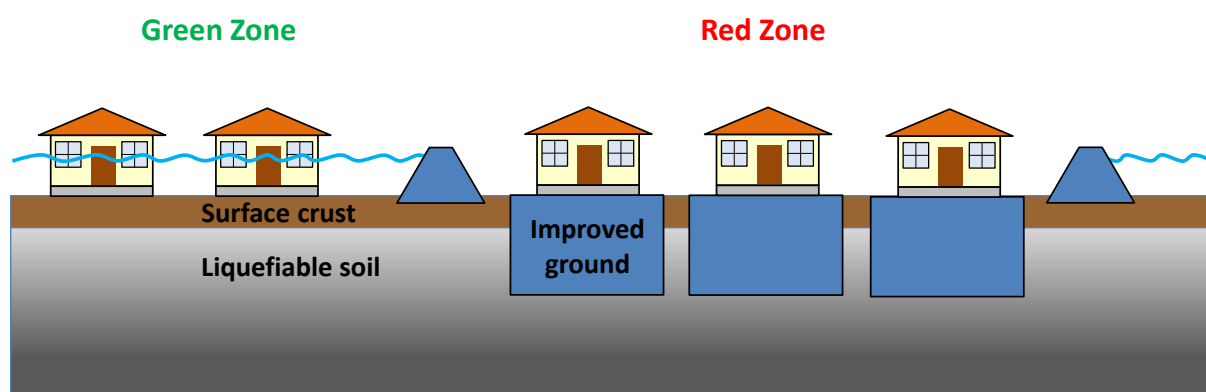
Concept 4 - Flood mitigation with ground improvement & dwellings at ground level. New dwellings have standard TC2-type foundations. Light blue line is 200 year flood level.
